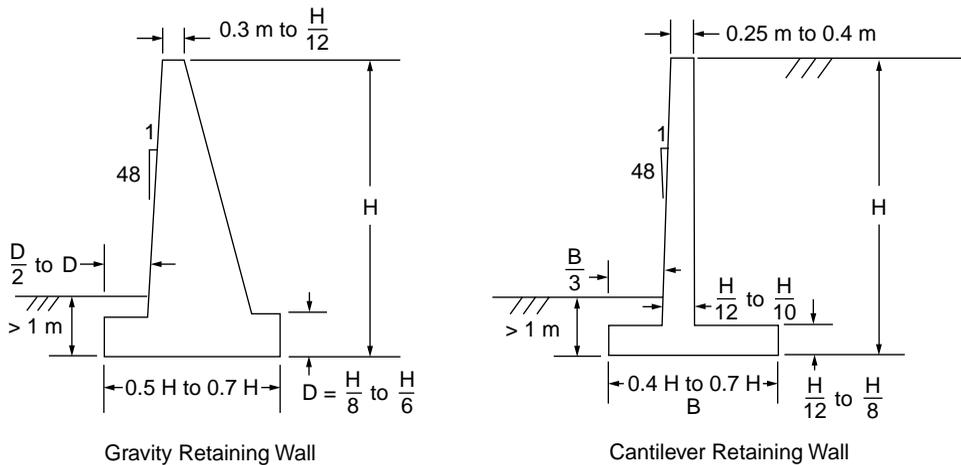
Tentative gravity and cantilever wall dimensions.
